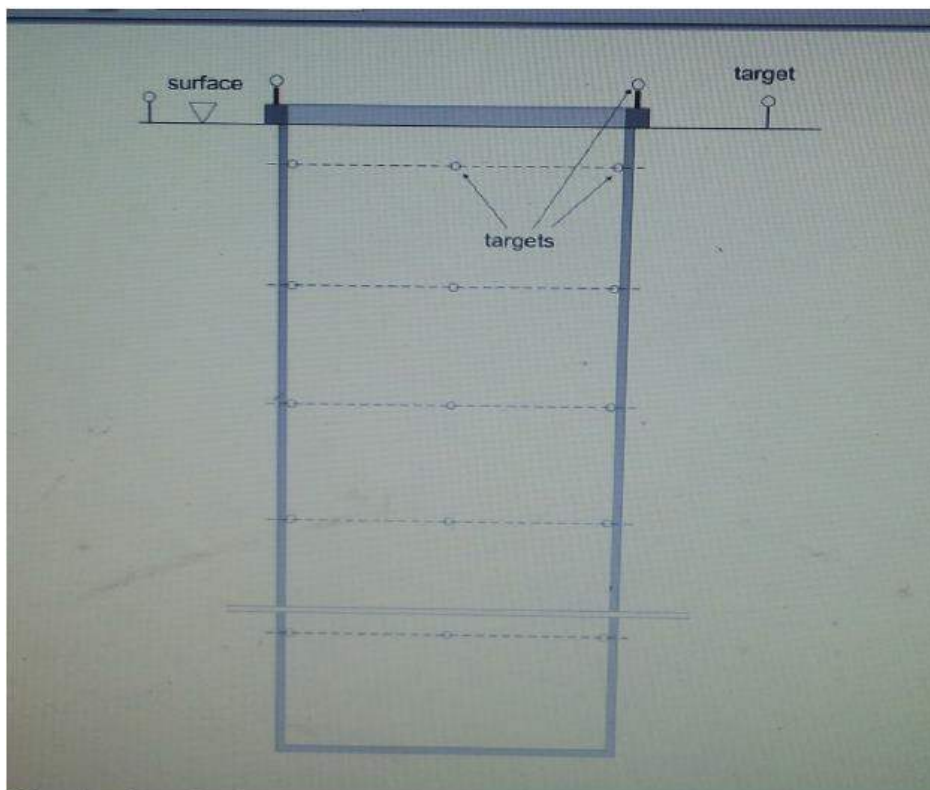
Sketch of monitoring layout for a circular shaft. [28]
